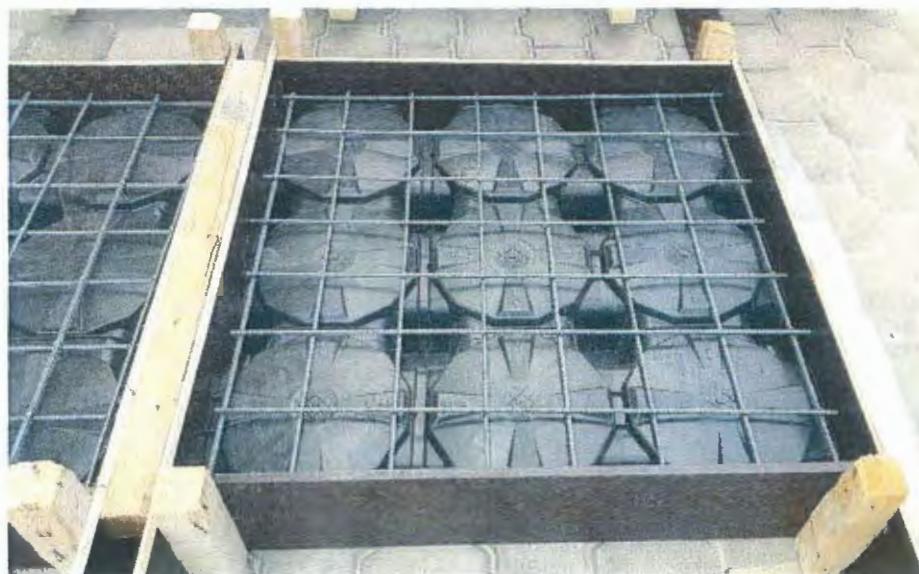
ABS disposable formwork with mesh steel reinforcement prior to concrete casting for sample Group (II) [normal concrete] and Group (III) [fiber concrete].
